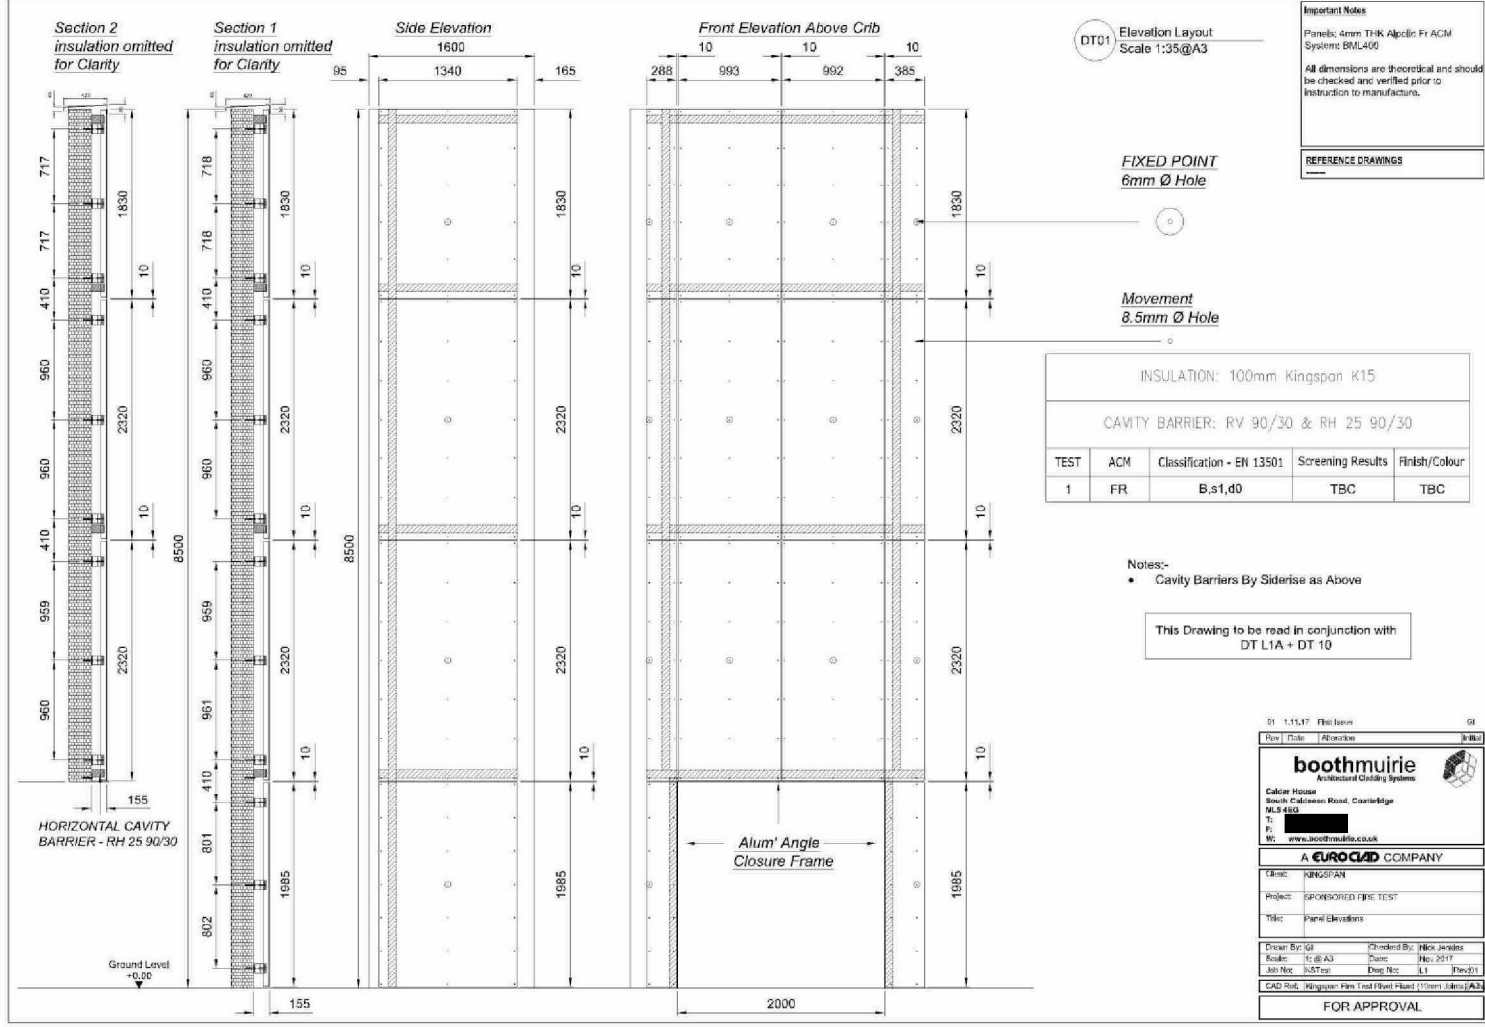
Cross sectional drawing (supplied by the test sponsor).
